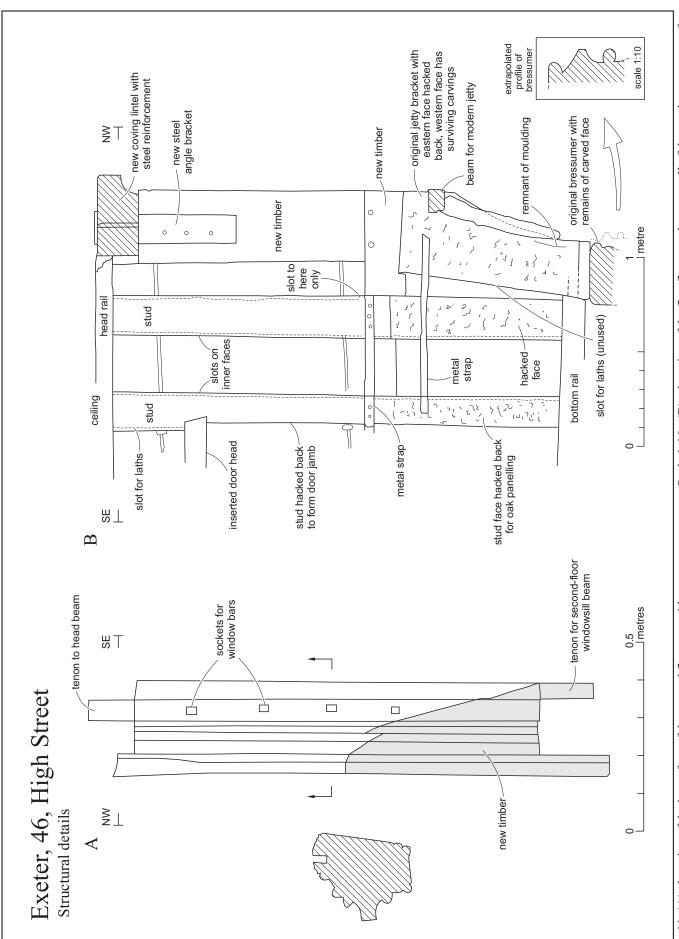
(A) elevation of the inner face of the second floor east side upper corner post. Scale 1:10. (B), elevation of the first floor south-west wall of the north-west room after removal of early C20th oak cladding. Scale 1:20.
